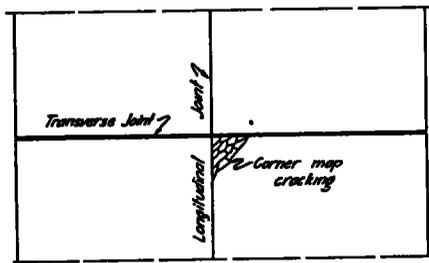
Corner Map Cracking of Concrete Pavements
